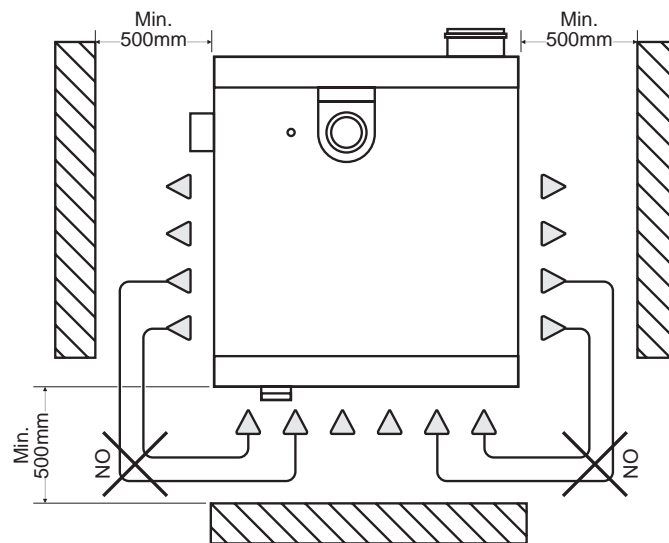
MINIMUM DISTANCES FROM WALL AND CEILING (OR ANY OTHER OBSTACLE) THE PRODUCT MUST BE INSTALLED TO GUARANTEE NECESSARY VENTILATION CONDITIONS
